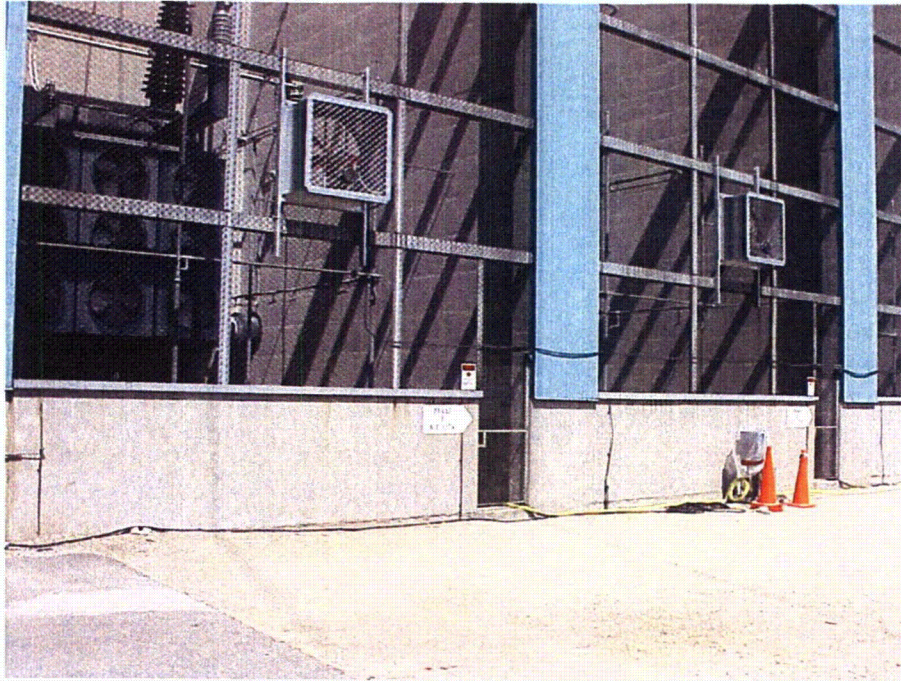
Station Transformers outside of Turbine Building within containment areas. Phase A & B units shown.
